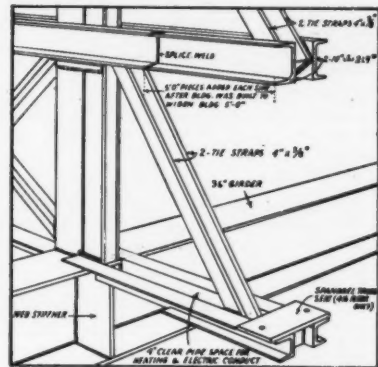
Column and Spandrel Support—Typical detail fourth to eleventh stories. Shows addition of 5'0" to building by splicing 10" channels to the frame. Tie straps are 4" x 3/4" angles.
